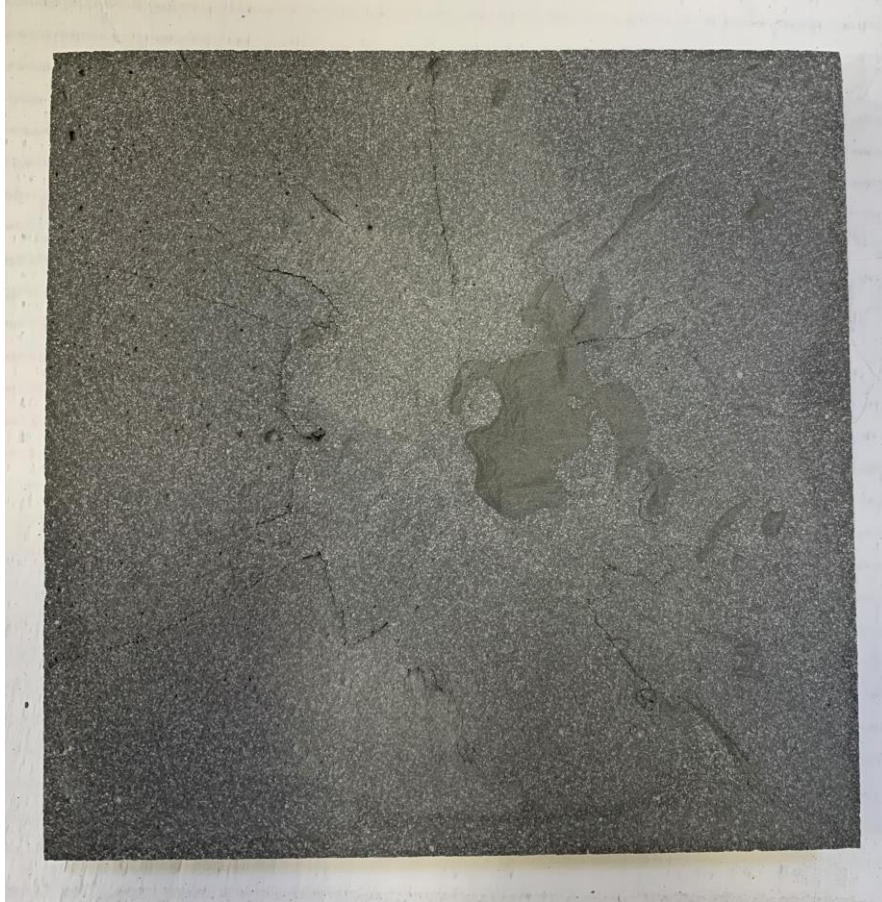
Typical cracking pattern on the rear face of UHPC core for a specimen manufactured with EAA resin.
